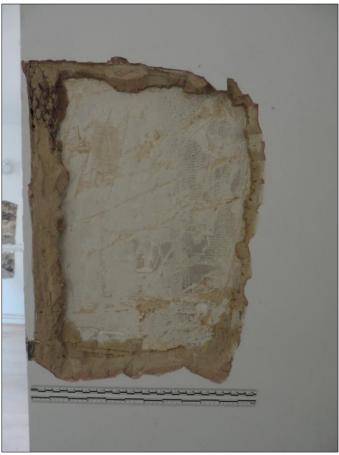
Limestone jamb of blocked doorway. Scale 300mm.
